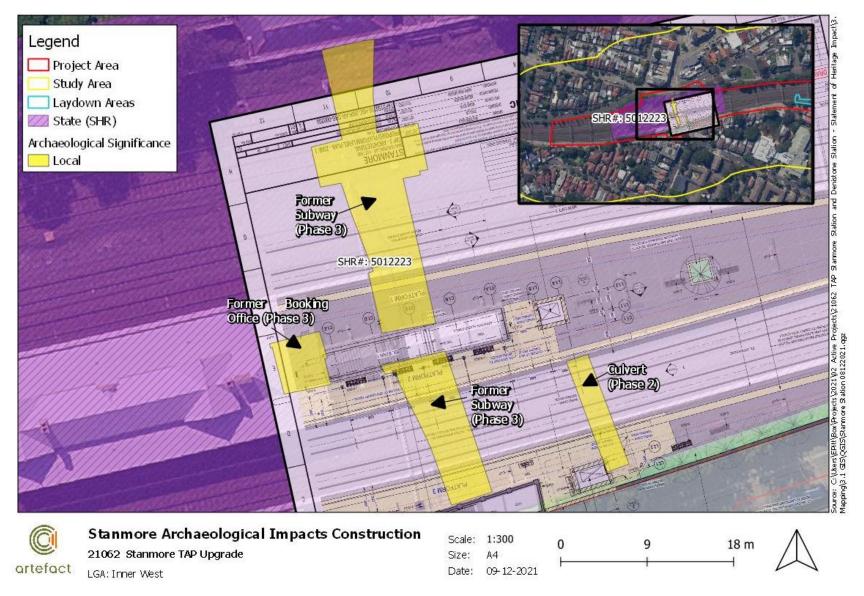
Plan of the proposed construction works at Stanmore Station, detailing the areas of archaeological potential (Source: Artefact, 2021)
